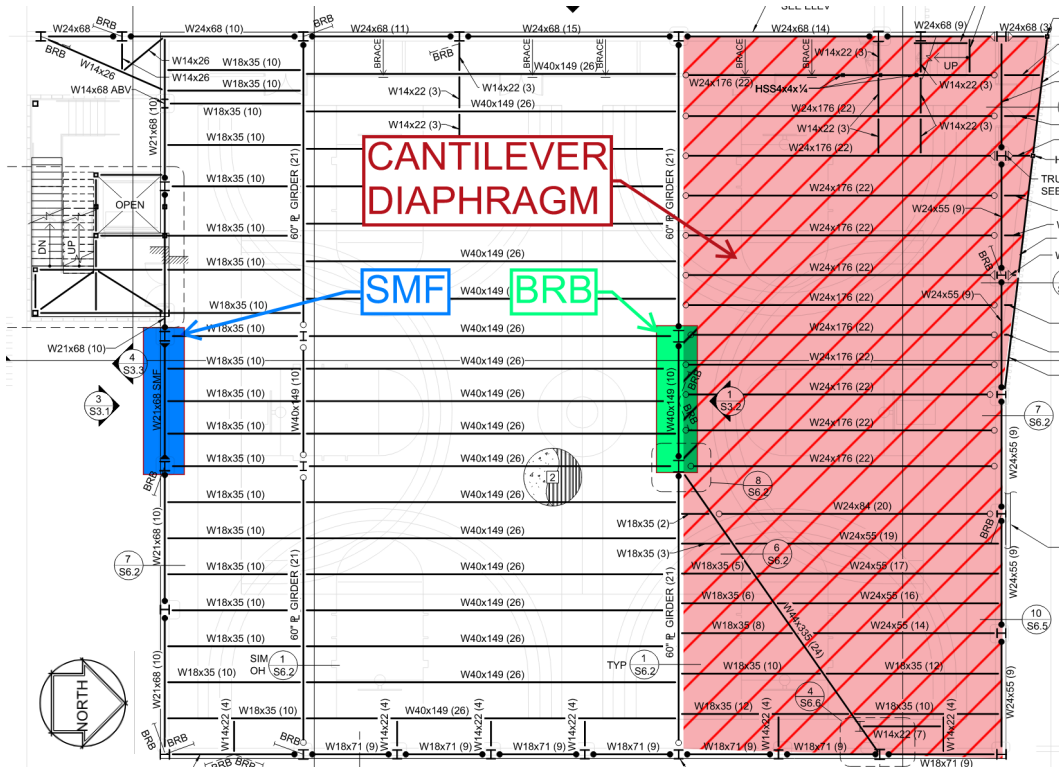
Floor Plan Showing LFRS Below and Cantilever Diaphragm
